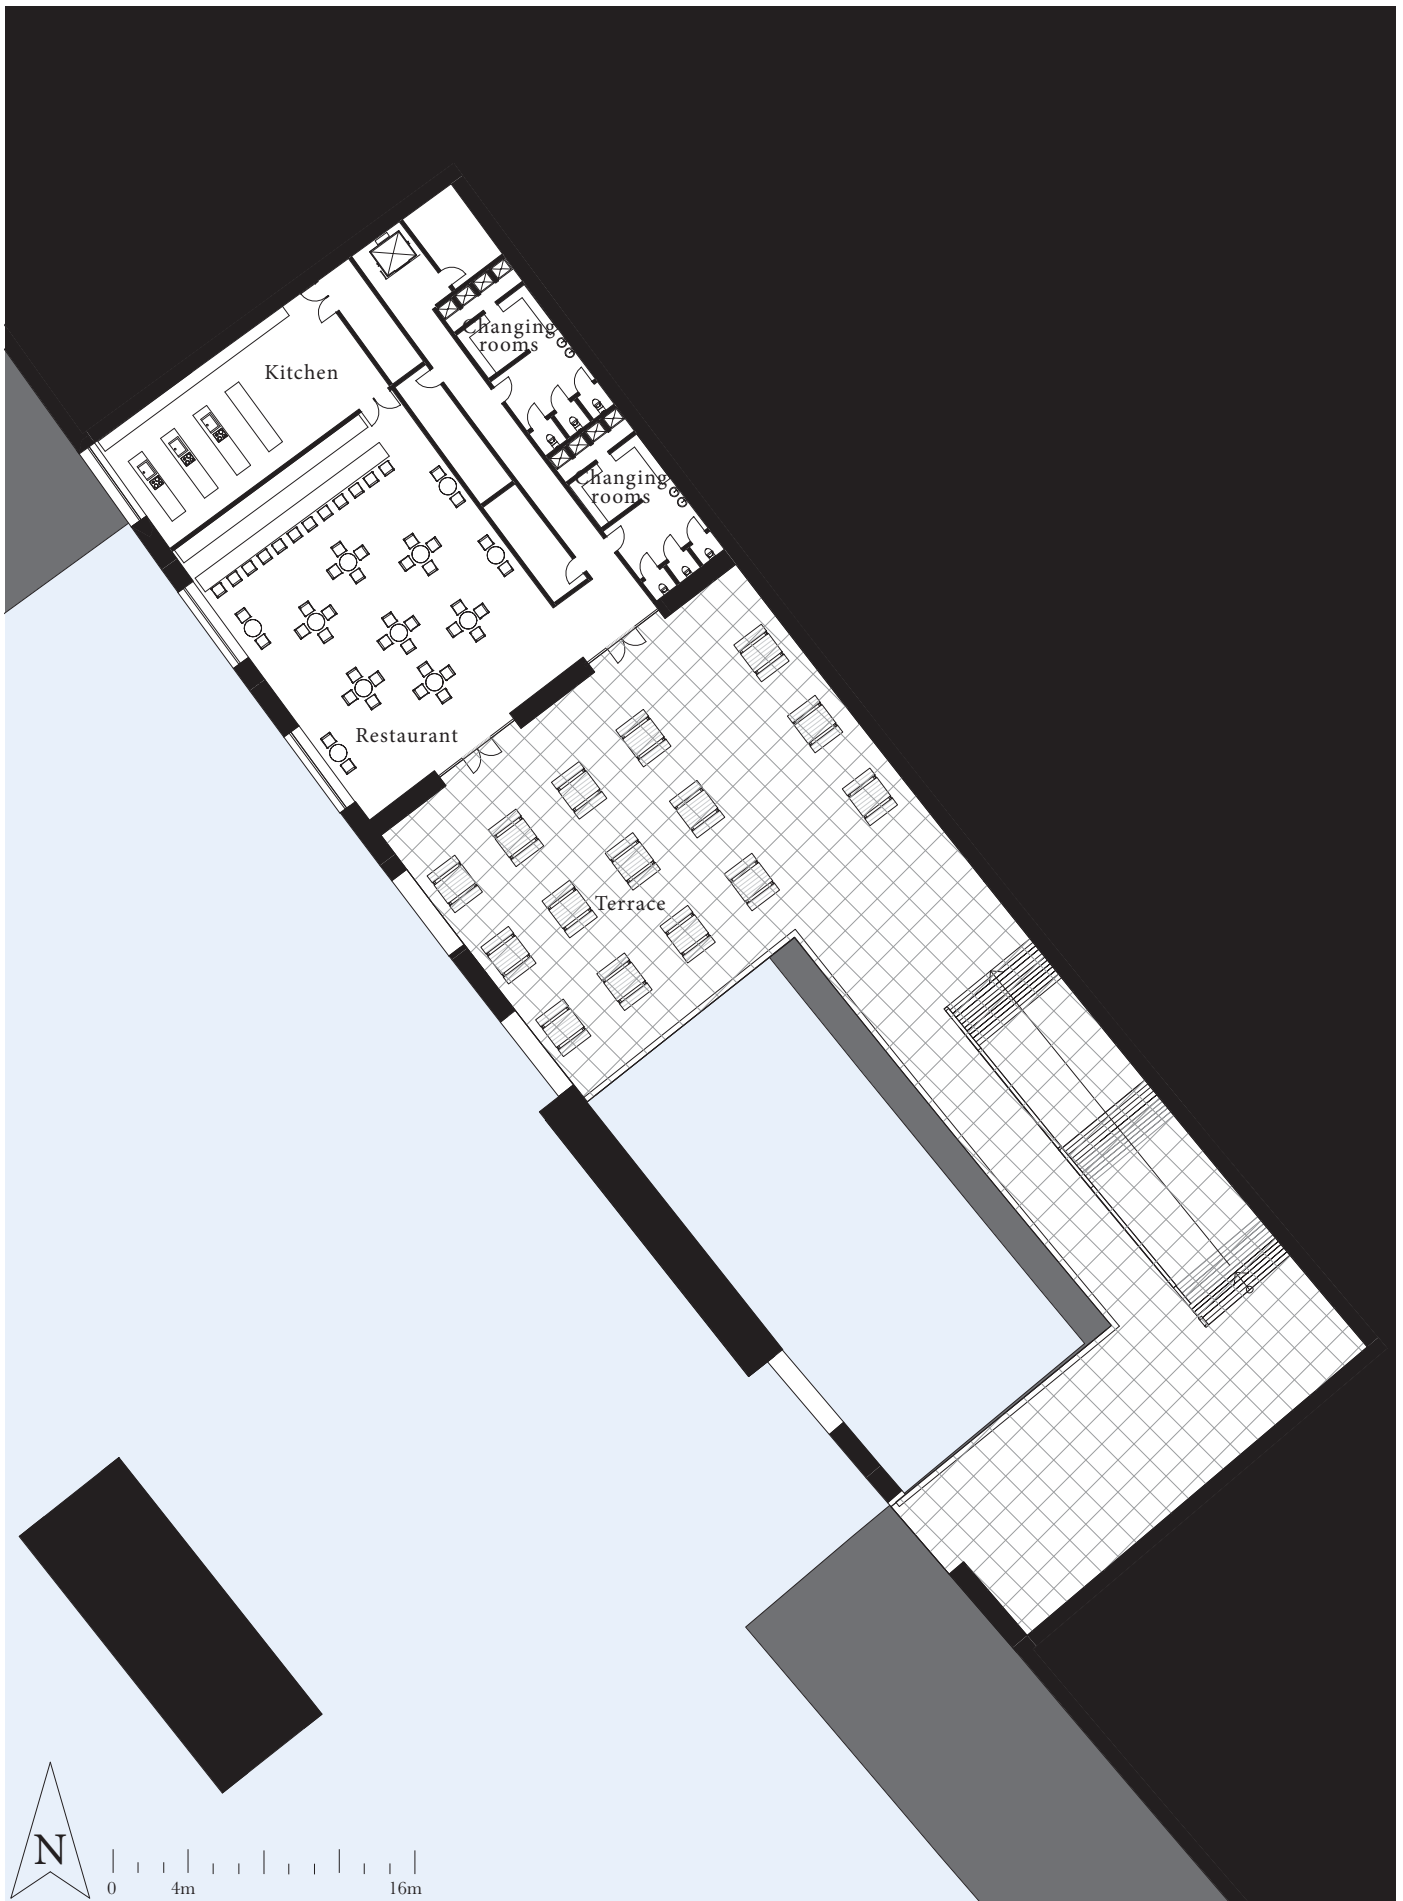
First basement level (-7,0 meter). Scale 1:400
